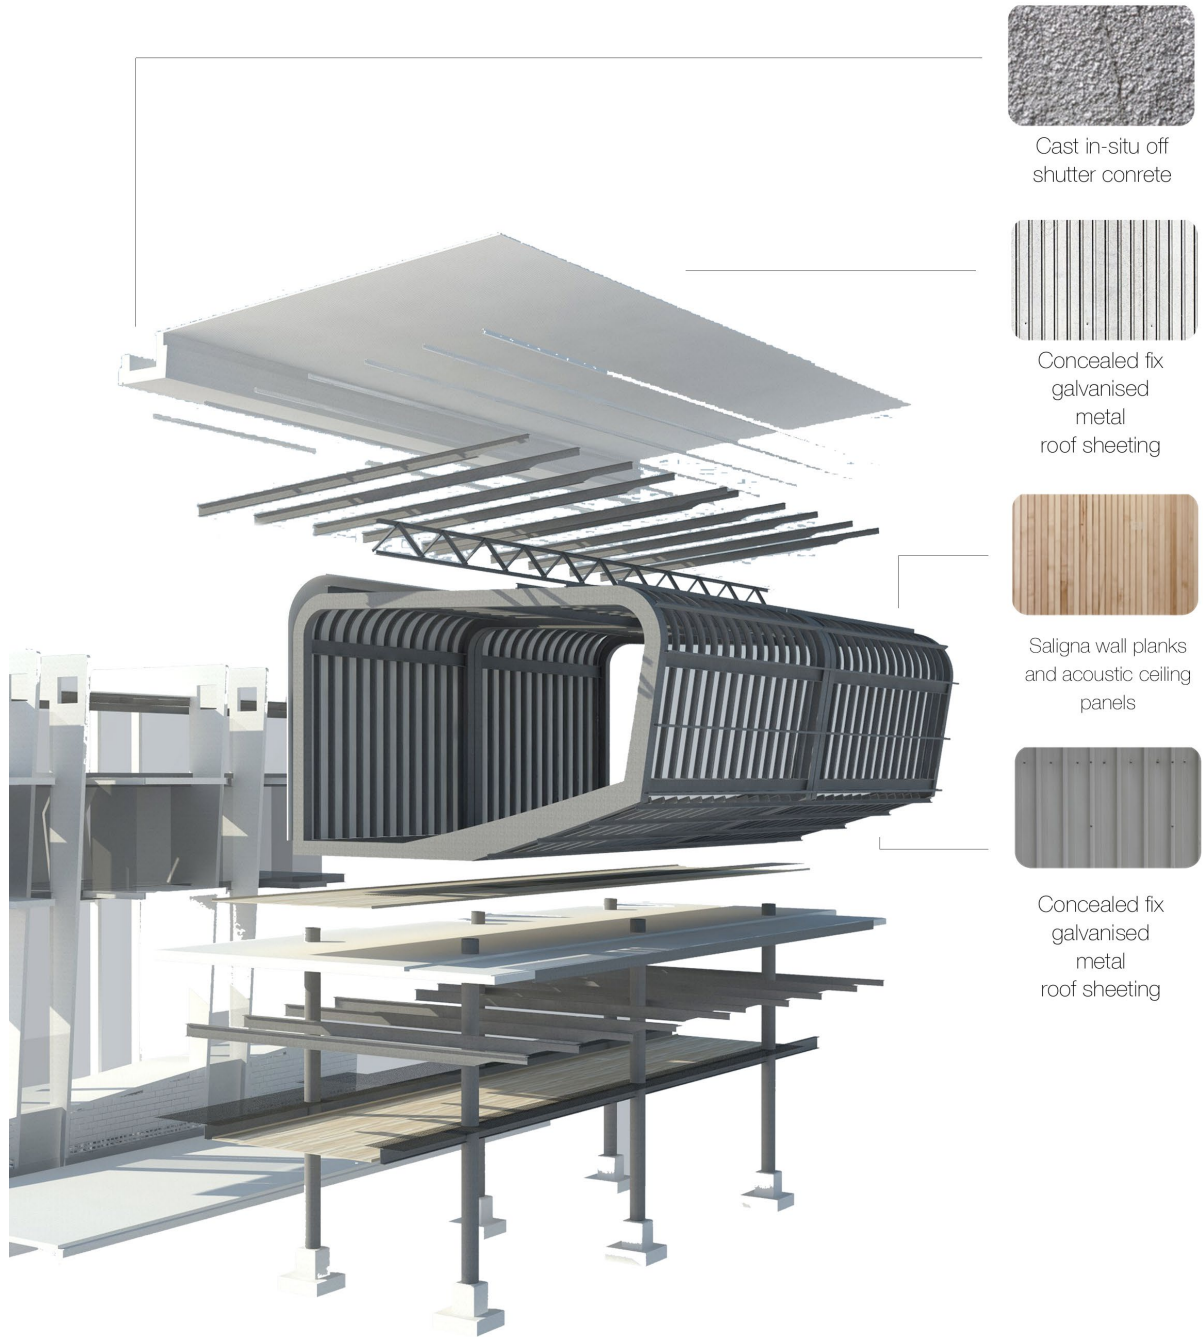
Detailed section of the auditorium structure (Author 2015)
